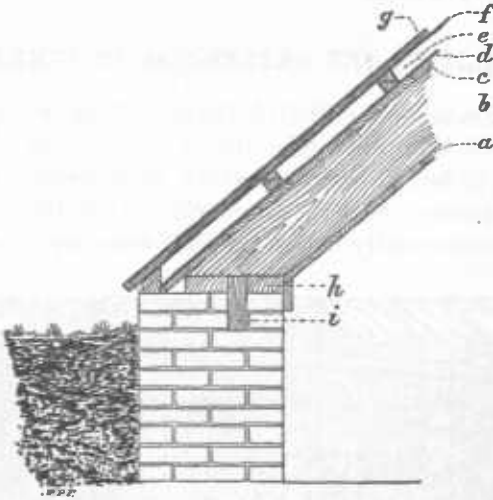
Detail of construction of roof of an improved storage cellar for celery.
